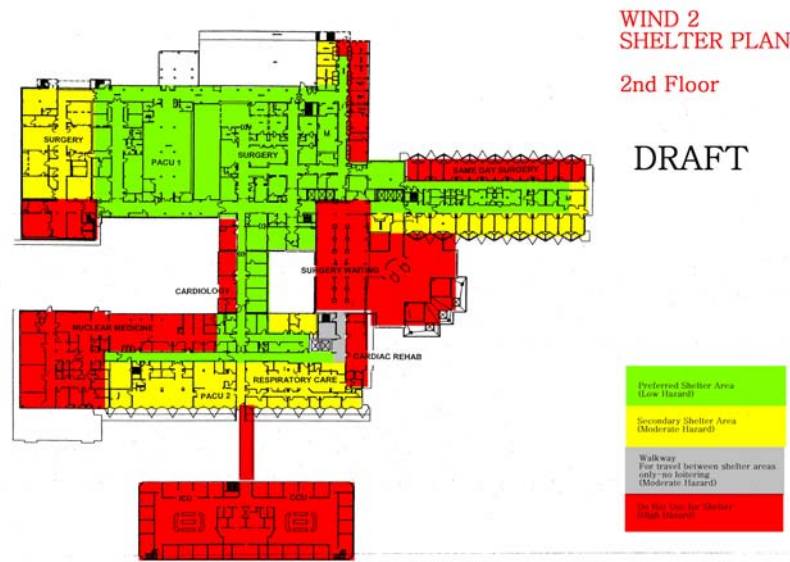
d Floor Wind 2 Shelter Plan
